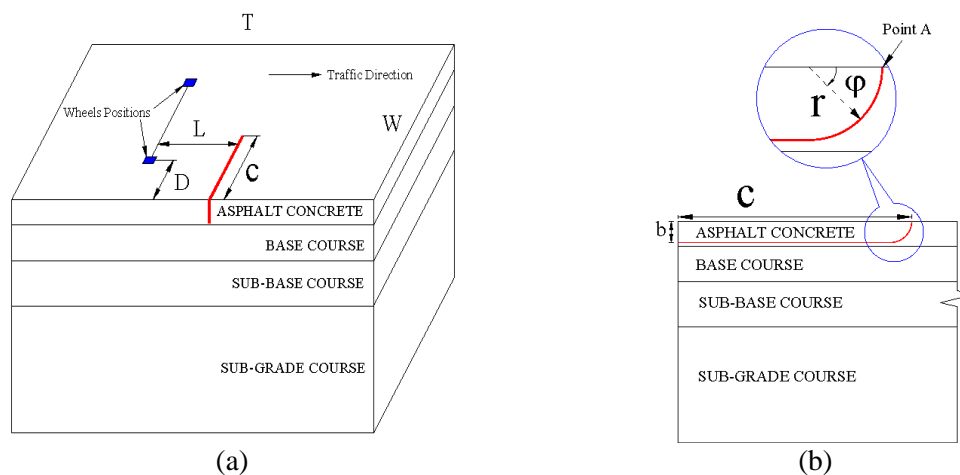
(a) Configuration of the cracked asphalt pavement, (b) side view and dimensions of a transverse crack
